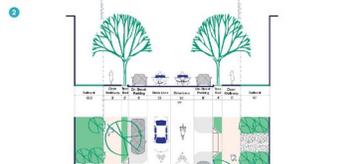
Typical Olive Avenue section between Ash Street and El Camino Real
